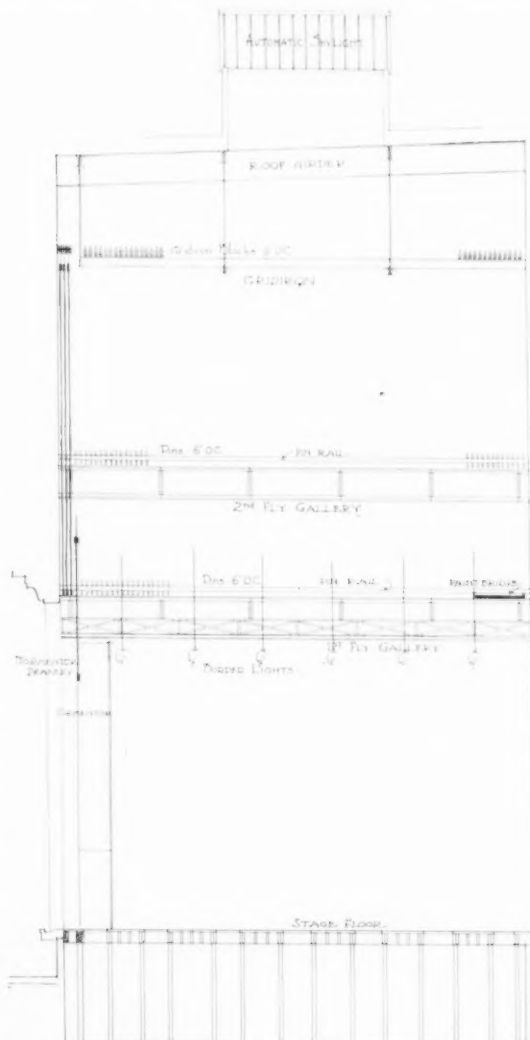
TYPICAL STAGE, LONGITUDINAL SECTION.
